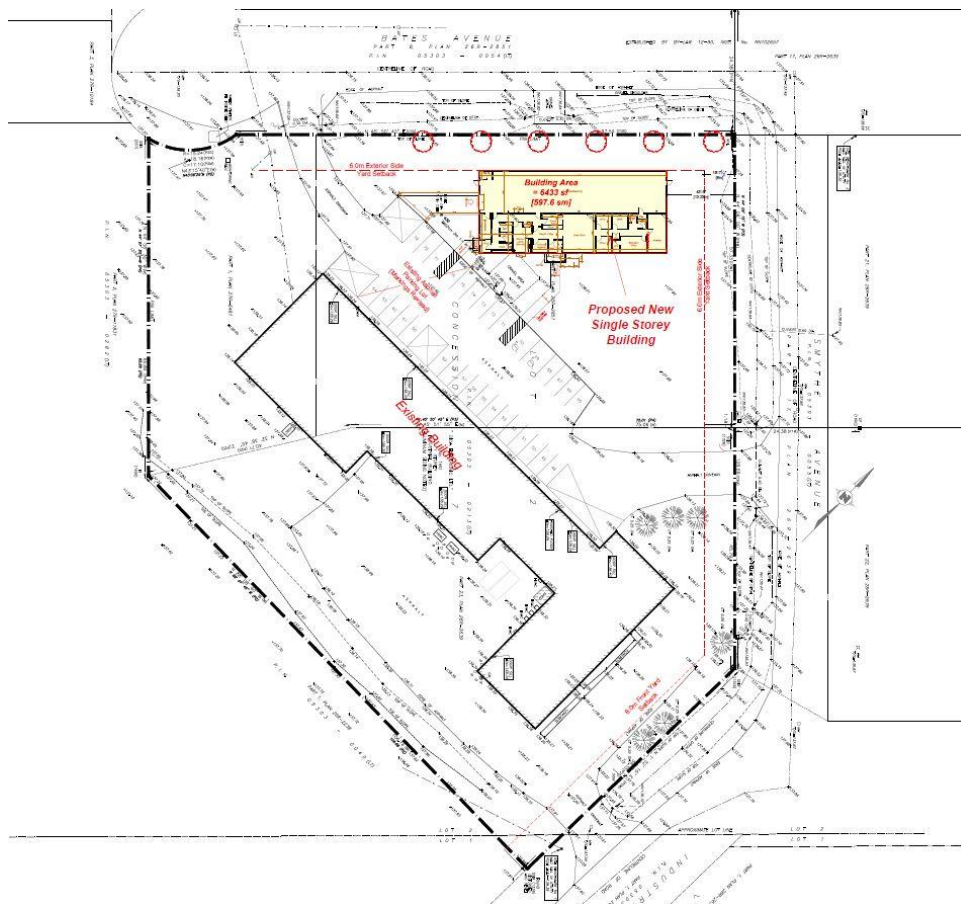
Excerpt of Site Plan Showing New Building On-Site
